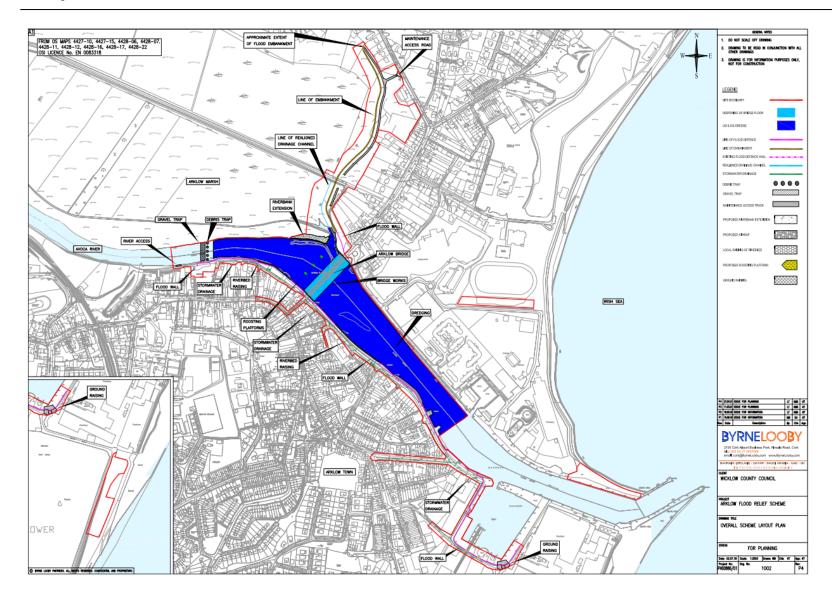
Flood defence wall & embankment key plan (Refer to Drawing 1002)
